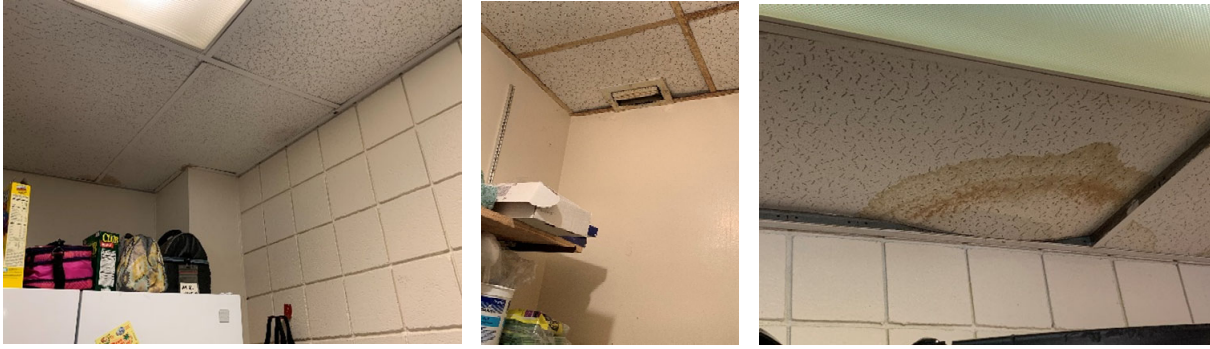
Examples of roof leaks and damaged ceiling tiles throughout upper level
